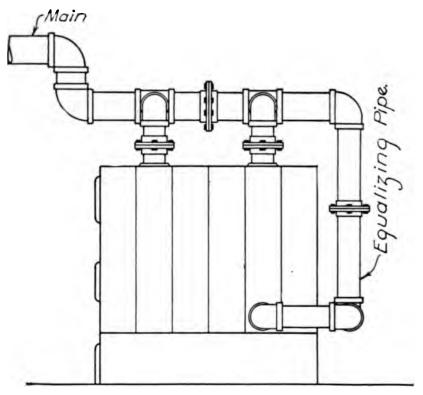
Showing Steam Header on Boiler.—Elevation.
